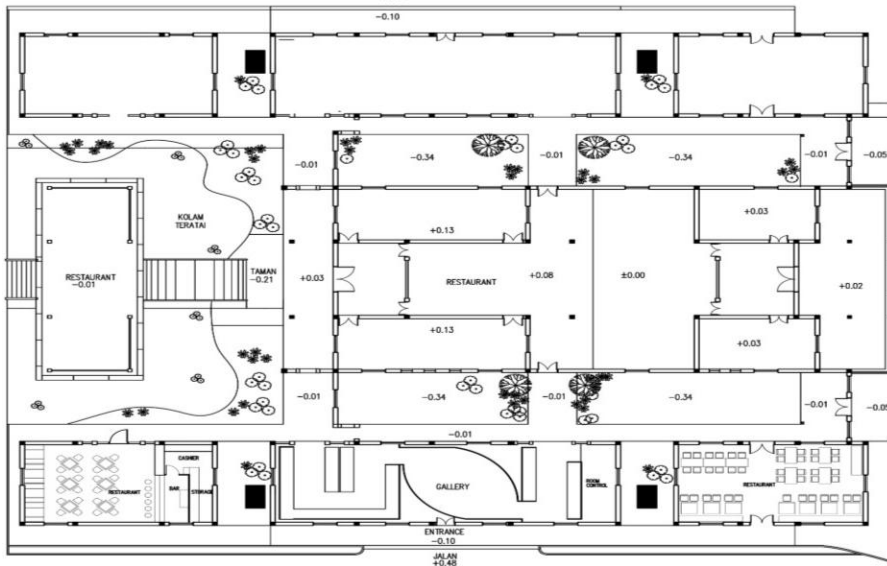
Candra Naya Floor Plan. (Source: Priyomarsonor, 2022)
